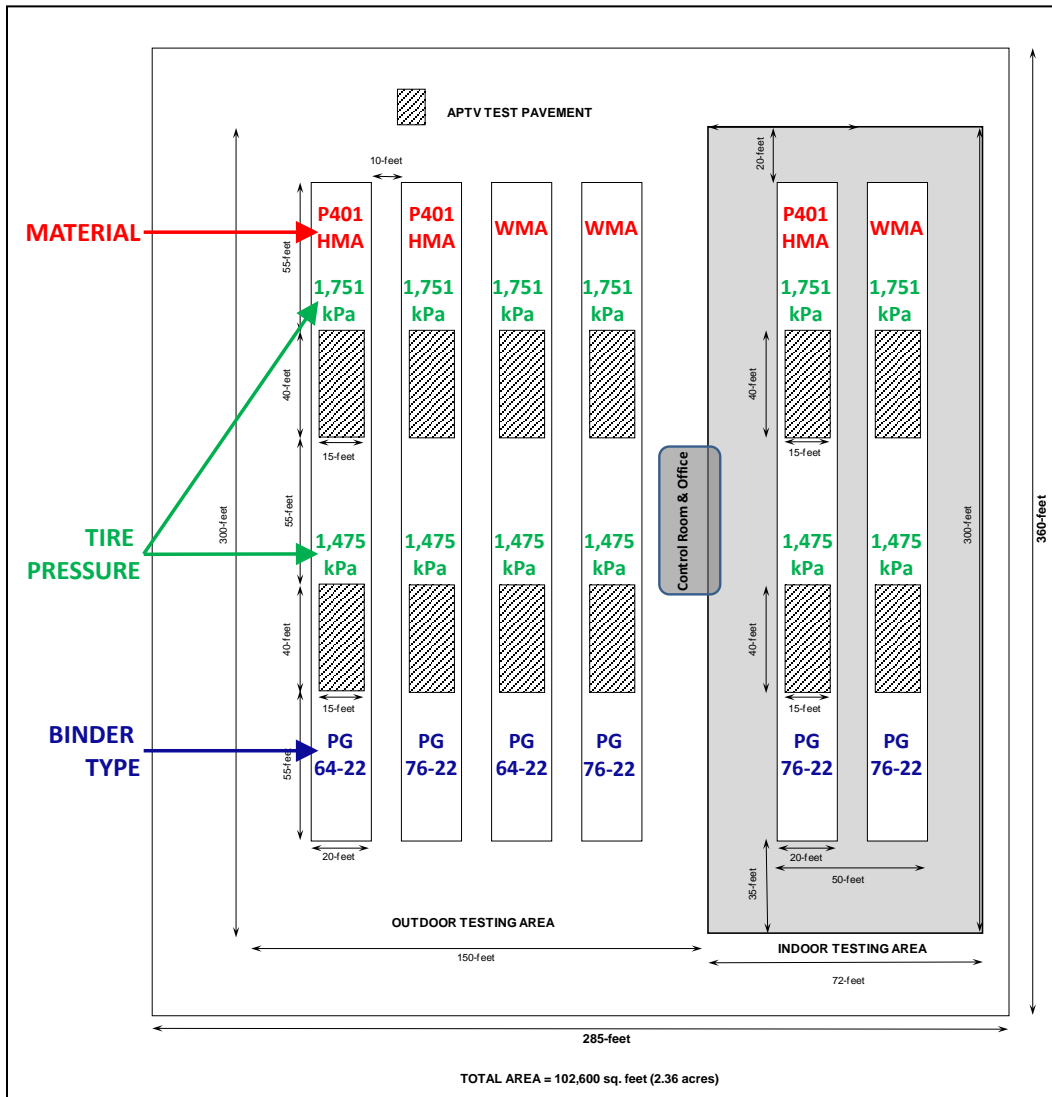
The FAA NAPMRC—Construction Cycle 1 Layout
